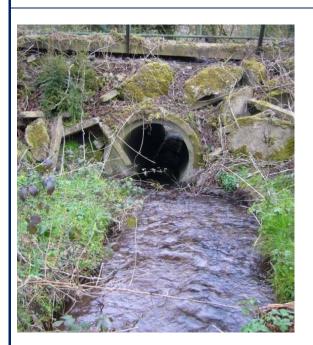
Downstream View of Donnybrook Survey Site (Site 4)
